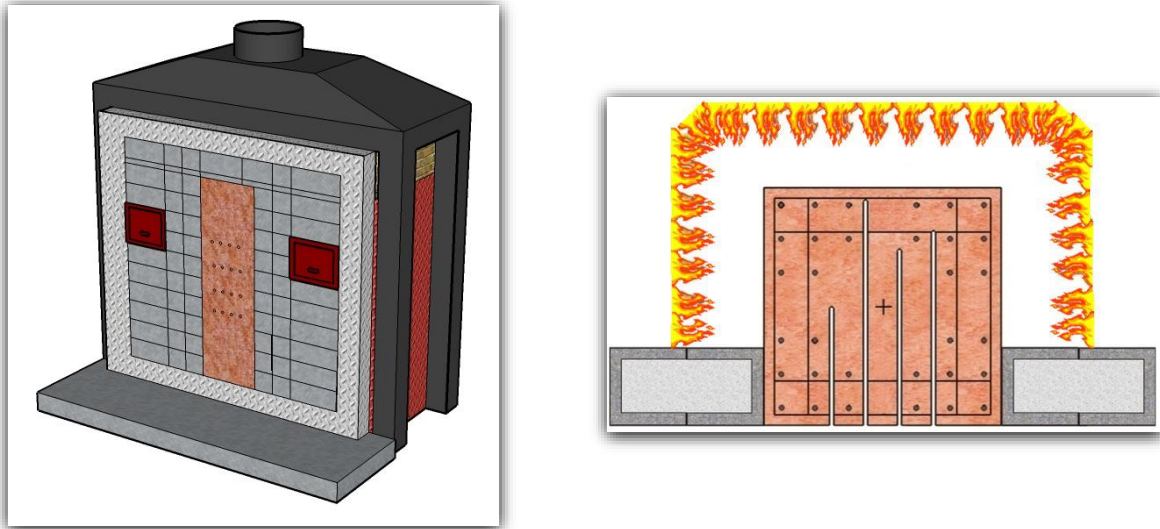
Testing furnace, prototype cross-section and thermocouples placing, and surfaces subjected to direct heating.
